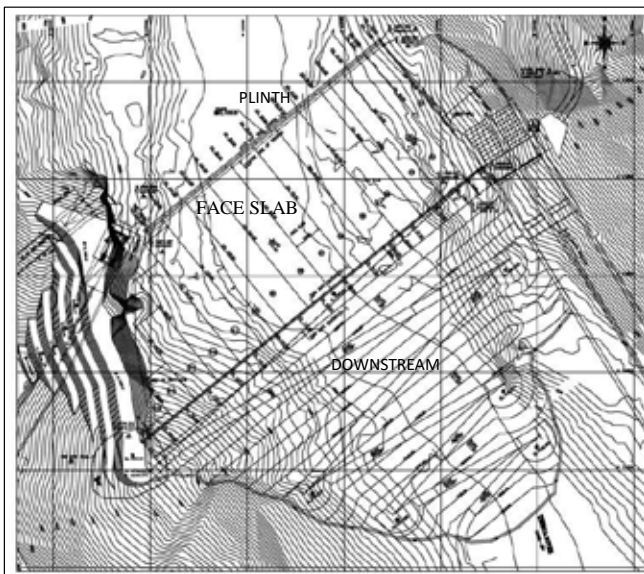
Teesta Hydropower Project Stage III : Layout of CFRD
